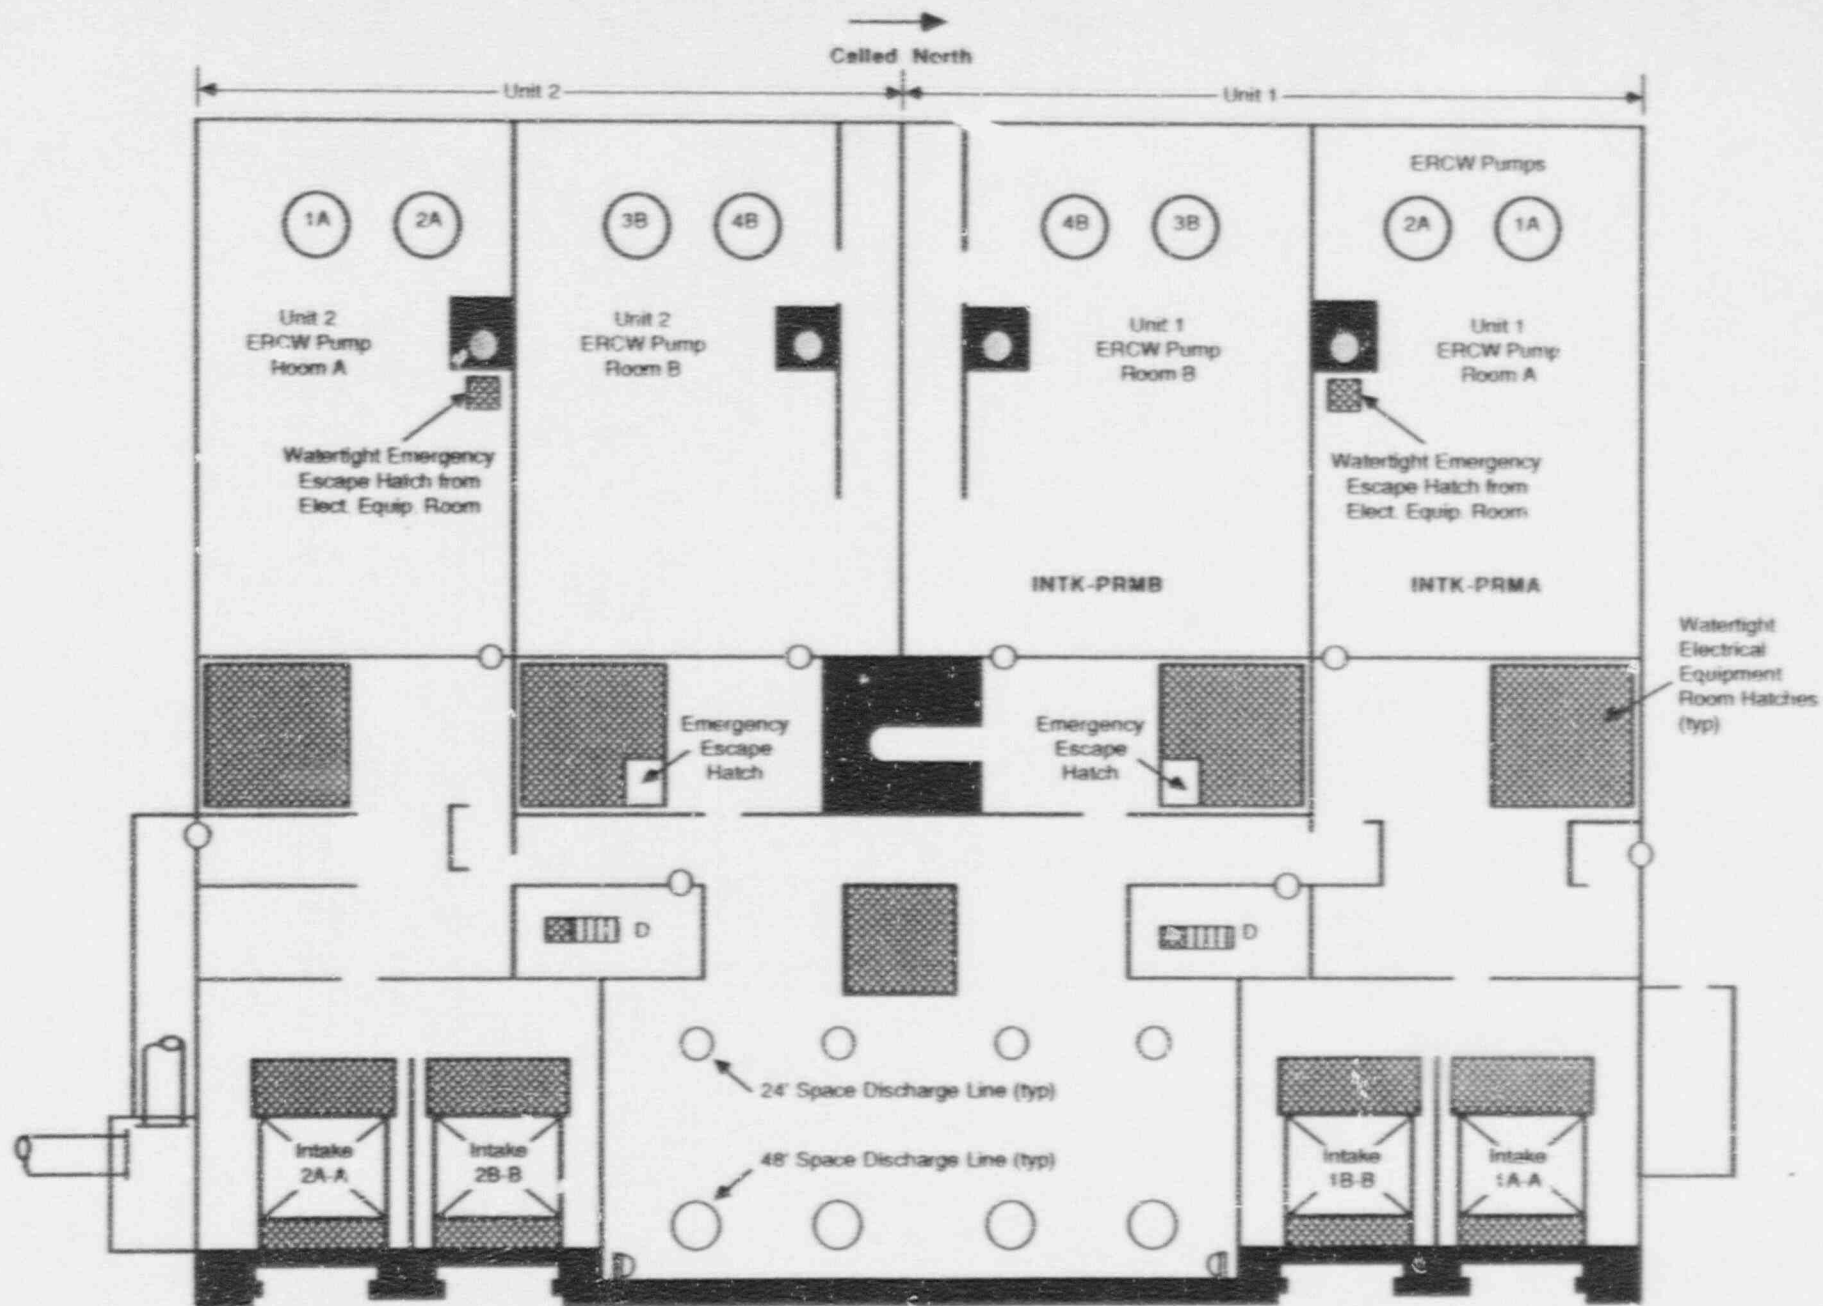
Bellefonte 1 and 2 Intake Pumping Station, Elevation 627'-0"
